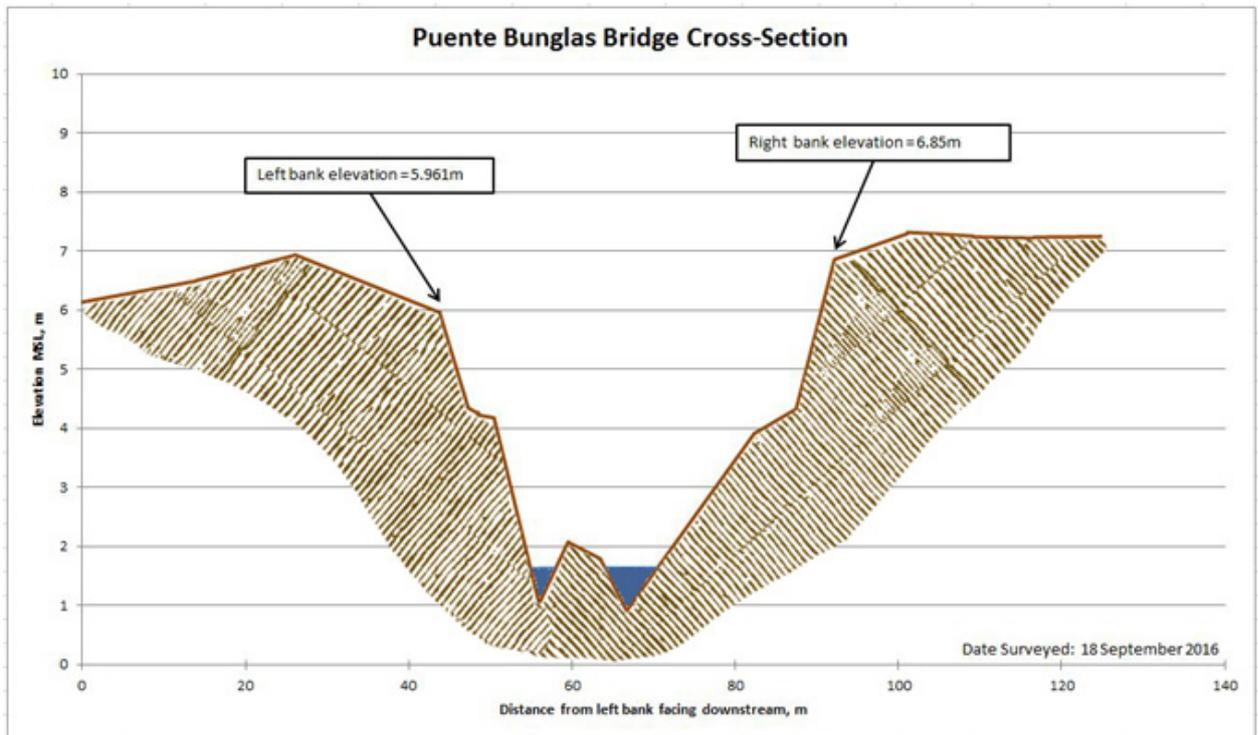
Cross-section plot of Puente-Bunglas Bridge
